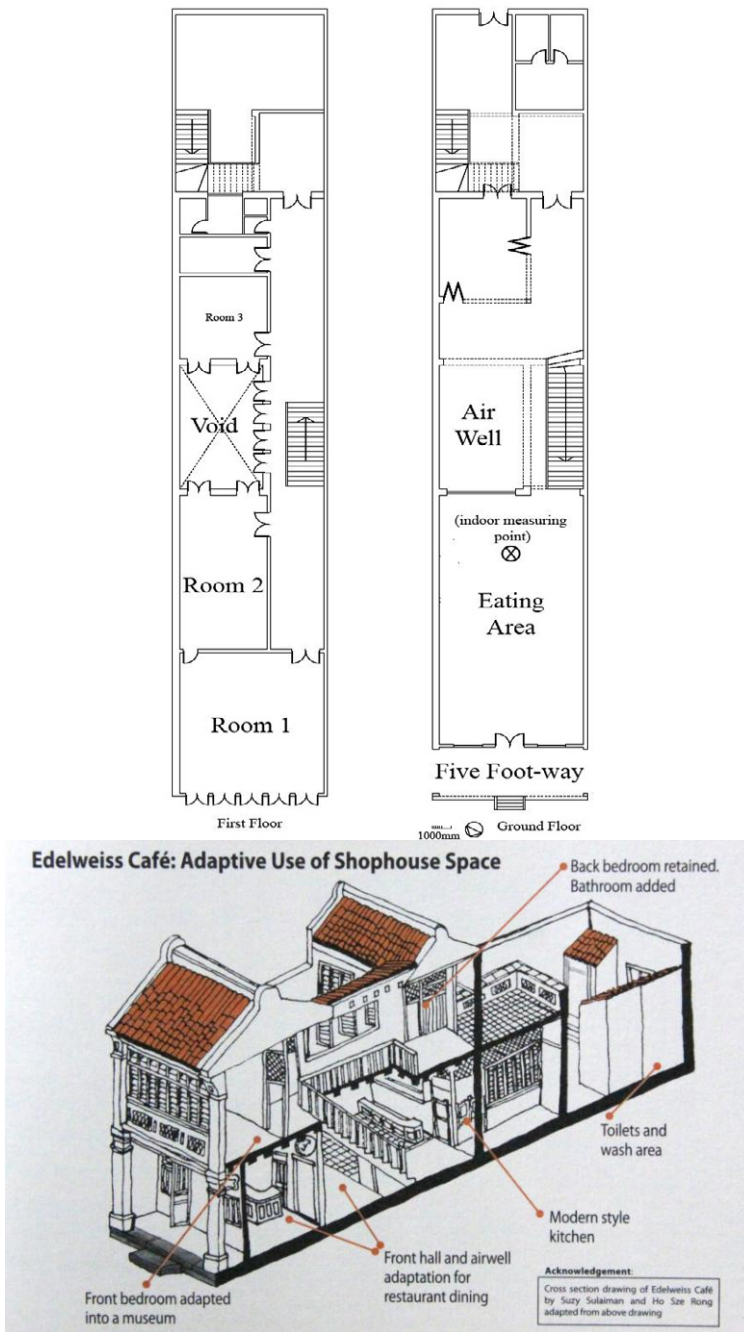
Floor plans of the shophouse, Figure 5: Cross section drawing of the shophouse
